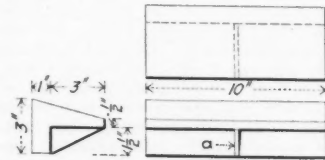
Dimensions of full-sized cast-iron Keys used on Boston & Maine Ry. for Stringers consisting of two pieces 10x12, superimposed. (The fin "a" prevents key from shaking out of its slot.)
